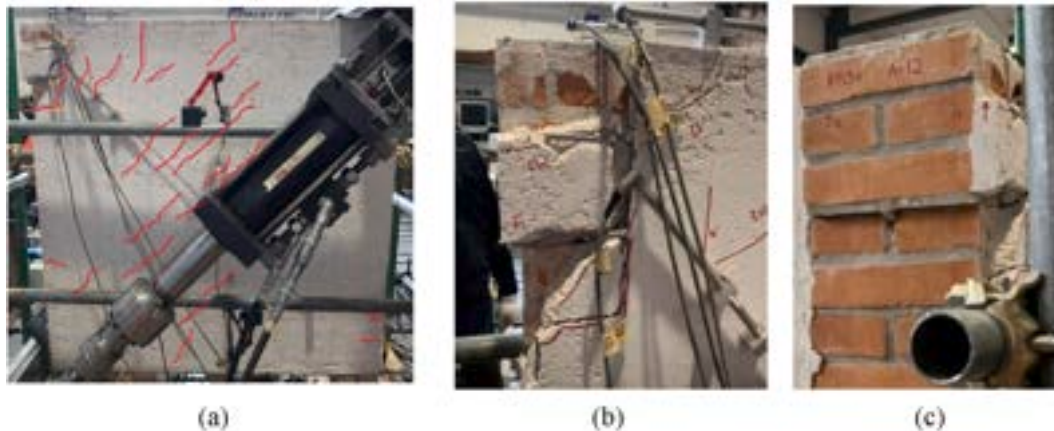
Damage pattern at the end of the test for lime plaster specimen MR2-3-12-L: (a) front, (b) corner and (c) sliding of the masonry bricks.
